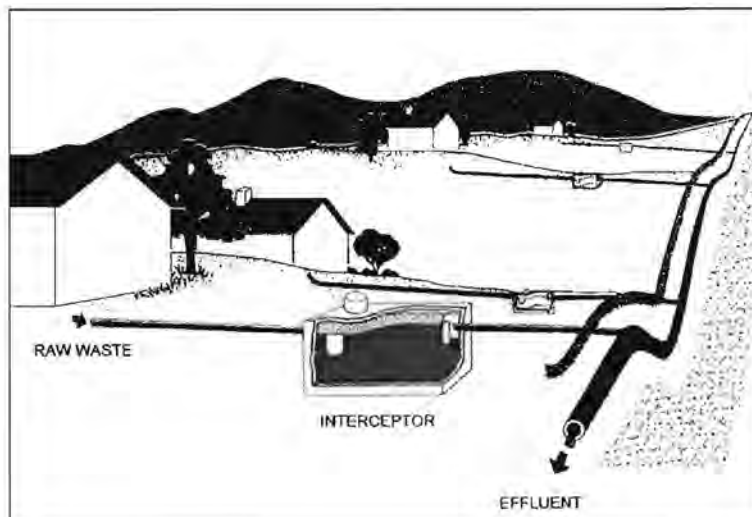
A schematic diagram of the arrangement of a settled sewerage system (Source: du Pisani, 1998)
